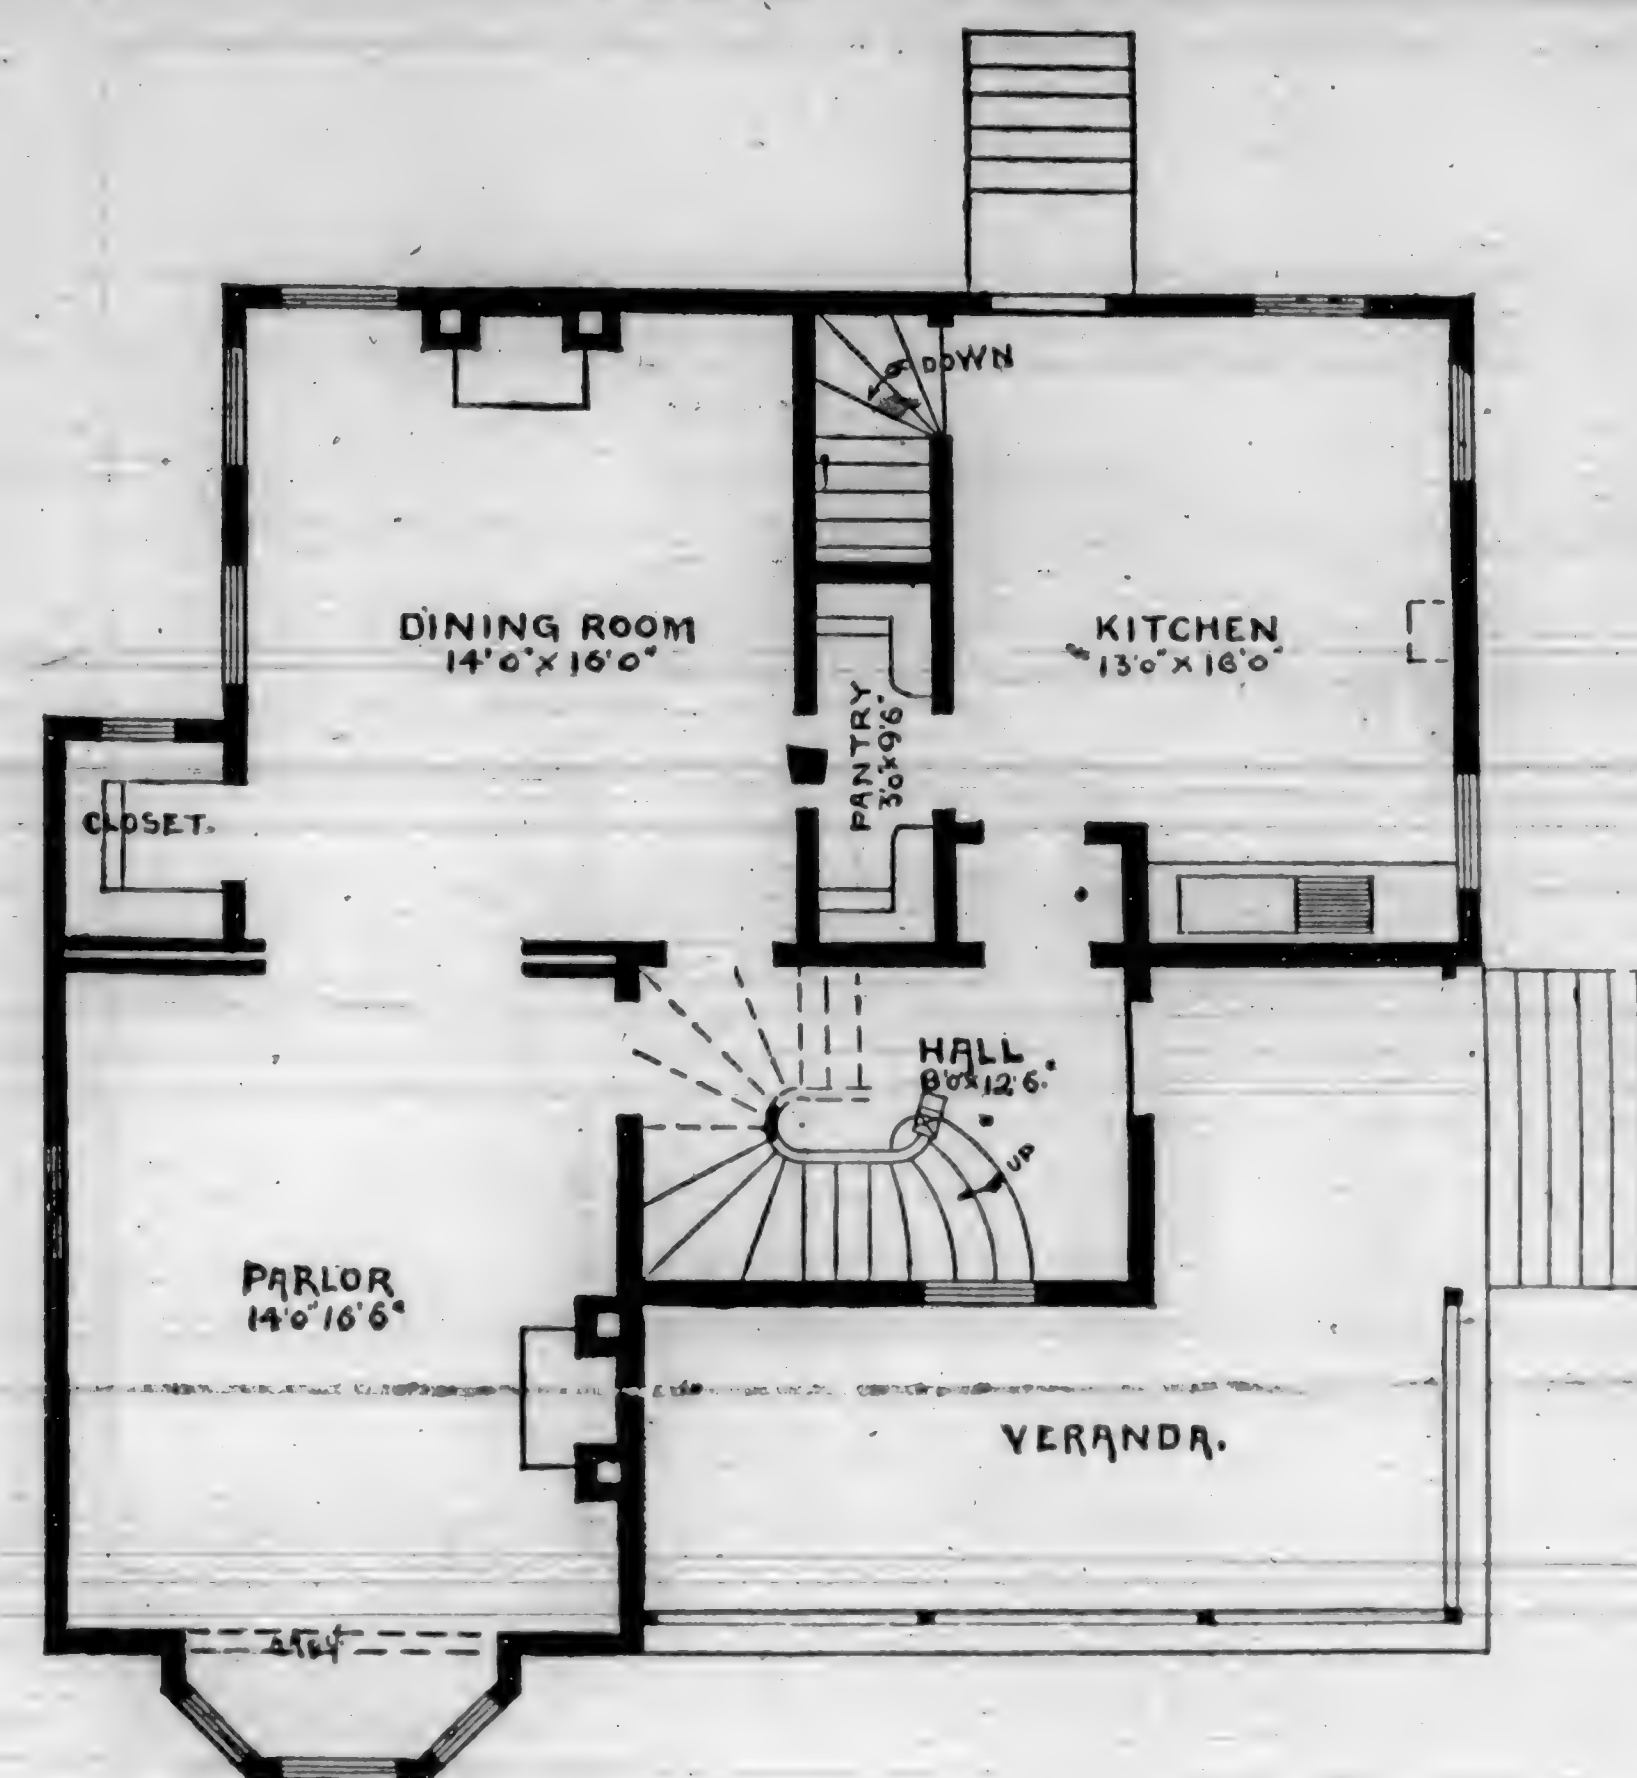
FIRST FLOOR PLAN OF SUBURBAN DWELLING.
